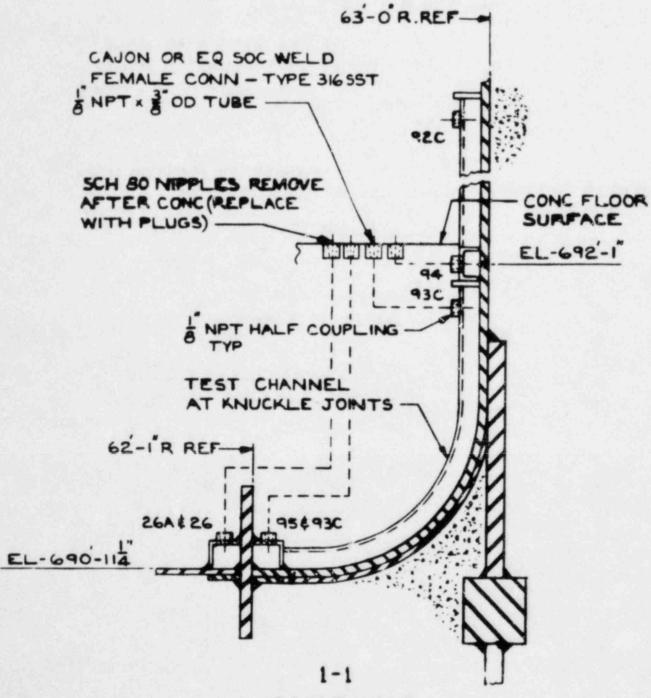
(a) SHEET I OF 2 TEST CHANNELS-FLOOR DETAILS
